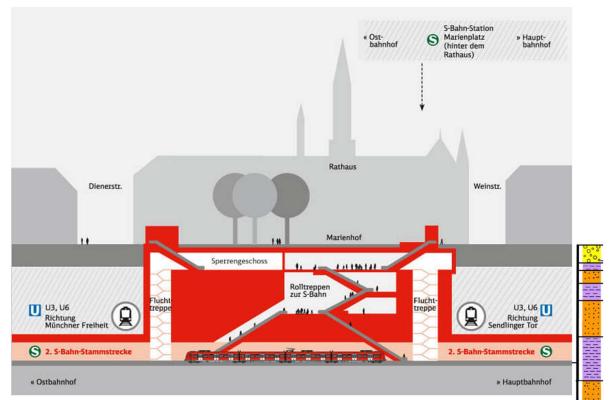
Schematic sketch of the new Marienhof station in Munich with the underground lines, the neighbourhood buildings and a typical soil profile (Source: https://www.2.stammstrecke-muenchen.de/marienhof.html, modified)
